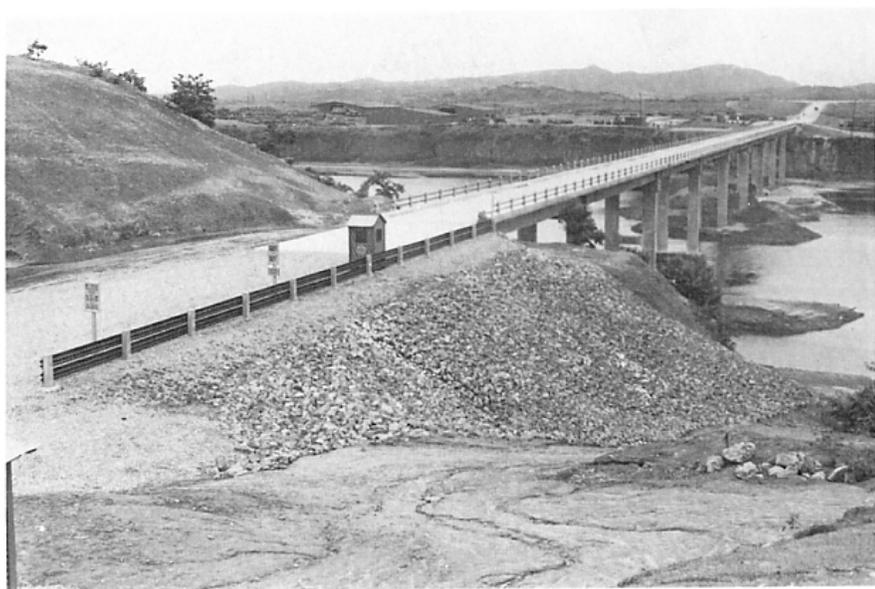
Completed Libby bridge from the west bank on 4 July 1953.
